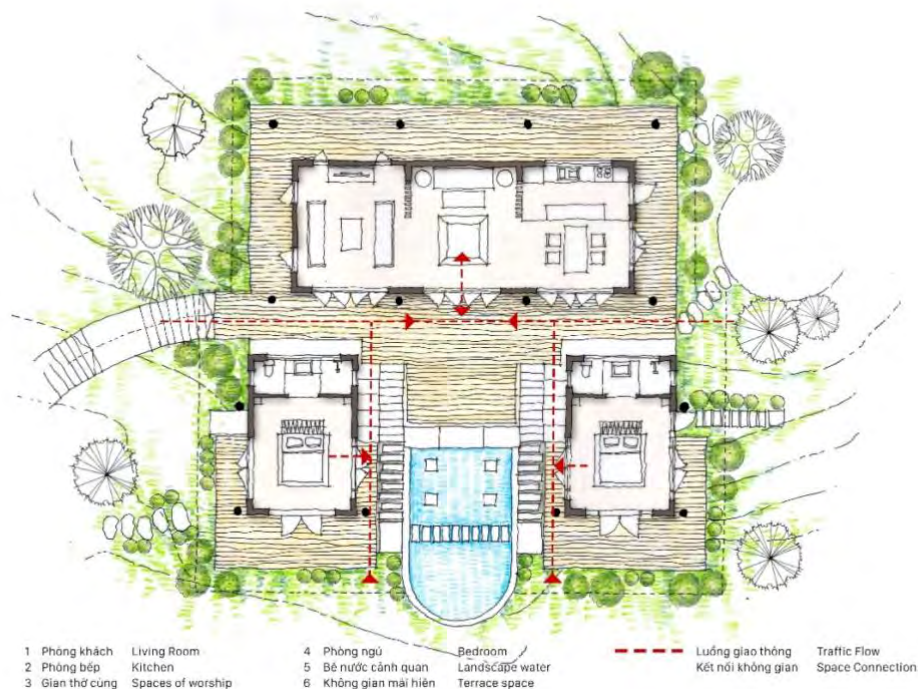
Large roof building ground plan (Atelier dubosc et Associates, 2022)
